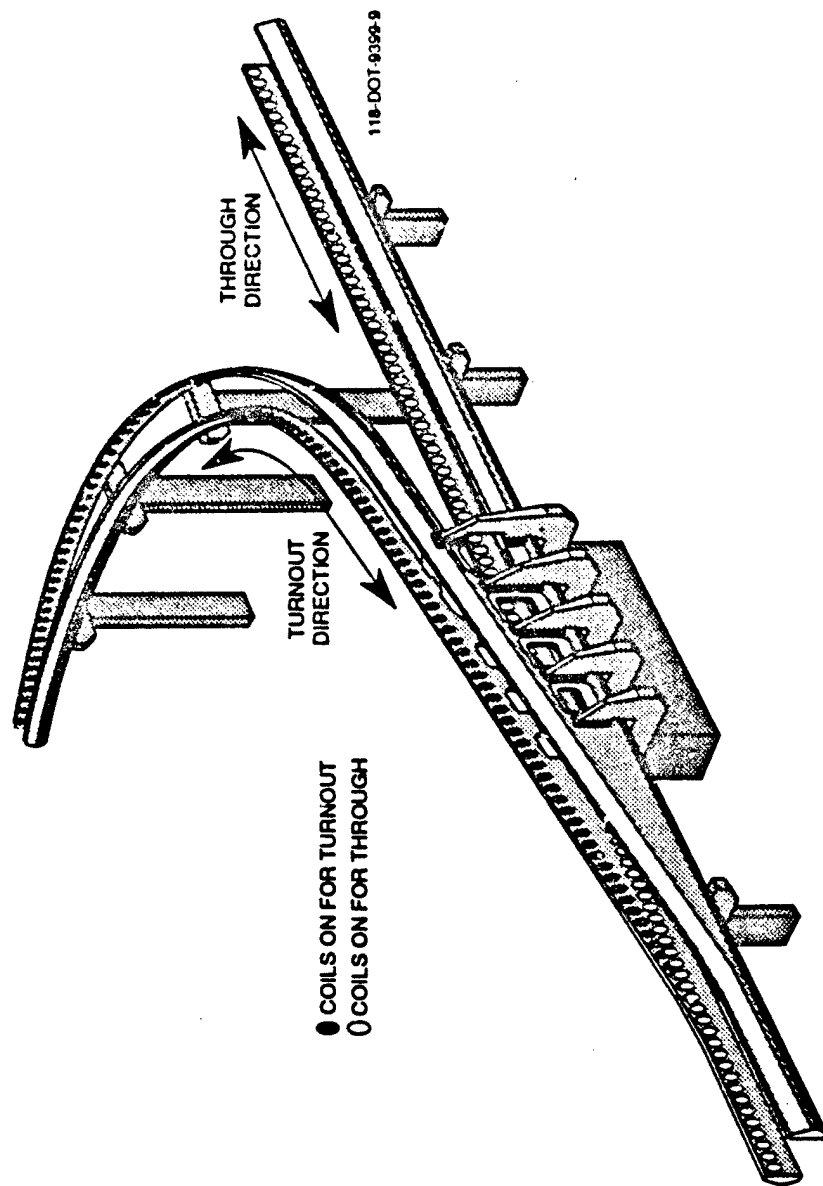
Vertical Switch Using Sidewall, "Null-Flux," Levitation and Sidewall Propulsion: Coils
